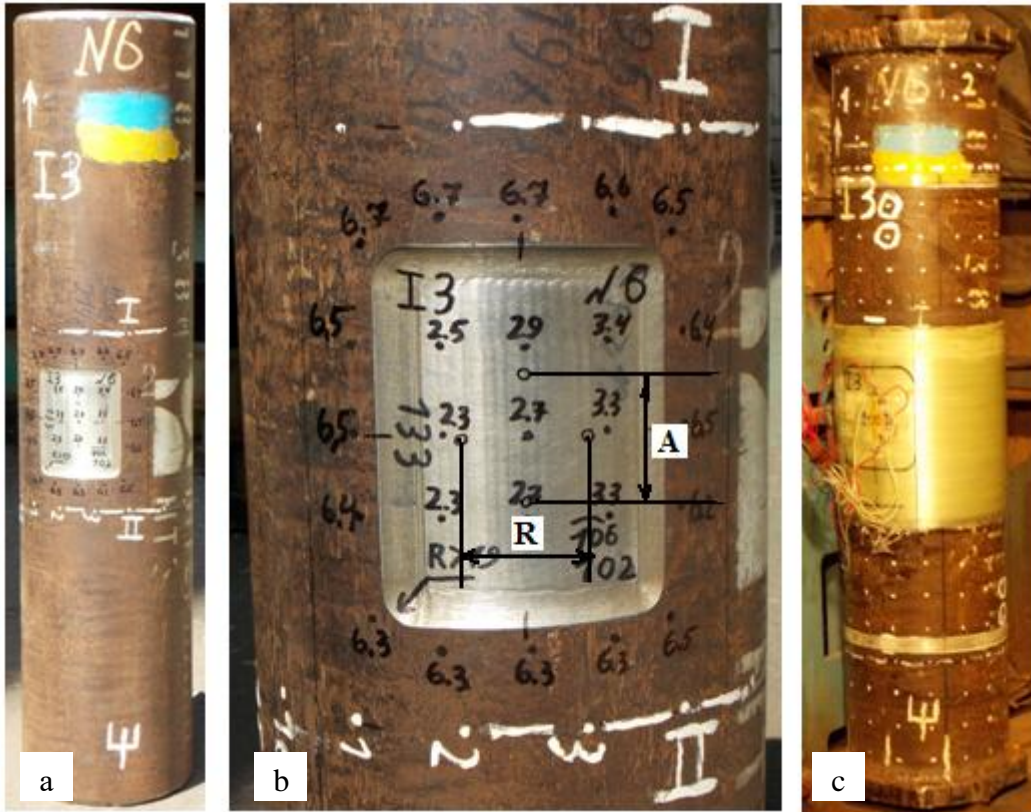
Sample I3: a – pipe section #6 with defect; b - defect; c - sample I3 with a bandage.
